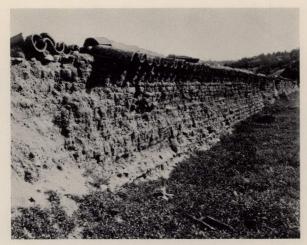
"AN ADOBE WALL WAS BUILT COV-ERED WITH TILE " Tile-covered adobe wall at Mission San Antonio de Padua, as it appeared in 1906. Photo by G. W. James, from the collection of The Huntington Library.
